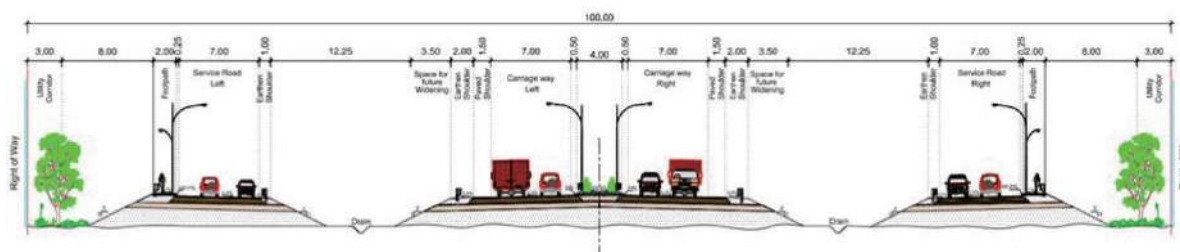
Typical Cross Section for Section 1 (Including TPP Link Road)
